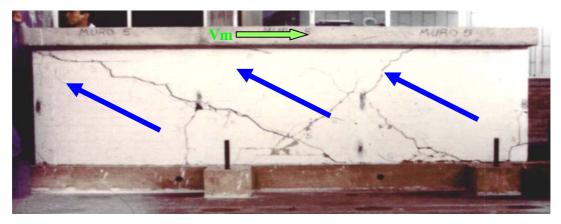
The cracked masonry wall contributes to the lateral strength.
